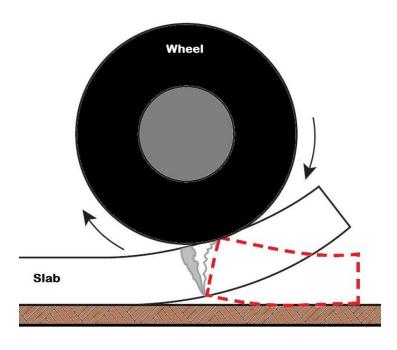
1: Warped slab cracks under the heavy wheel loading (Kosmatka et al 2003)
